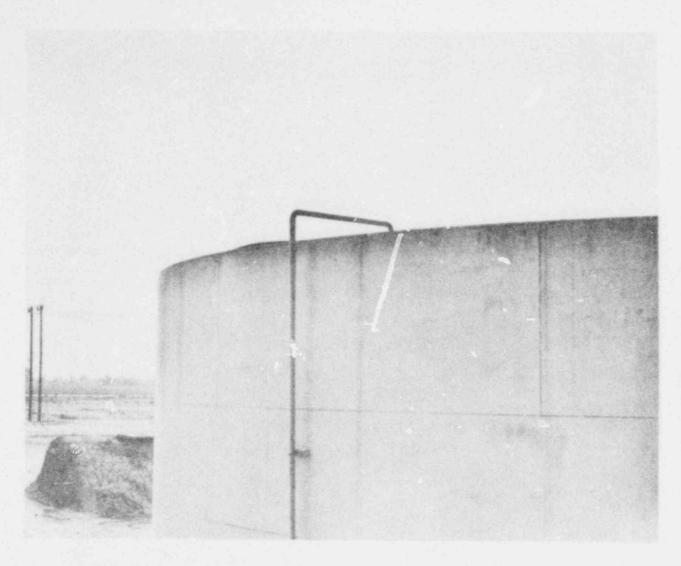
Tank No. 3 was drained and entry was made during the August site visit. Of the 5 columns supporting the roof, one was badly buckled, causing the roof to sag locally. At about 90° from the buckled column, the roof-to-tank wall weld joint had failed, opening up a crack several feet long where fuel oil sloshed out.
